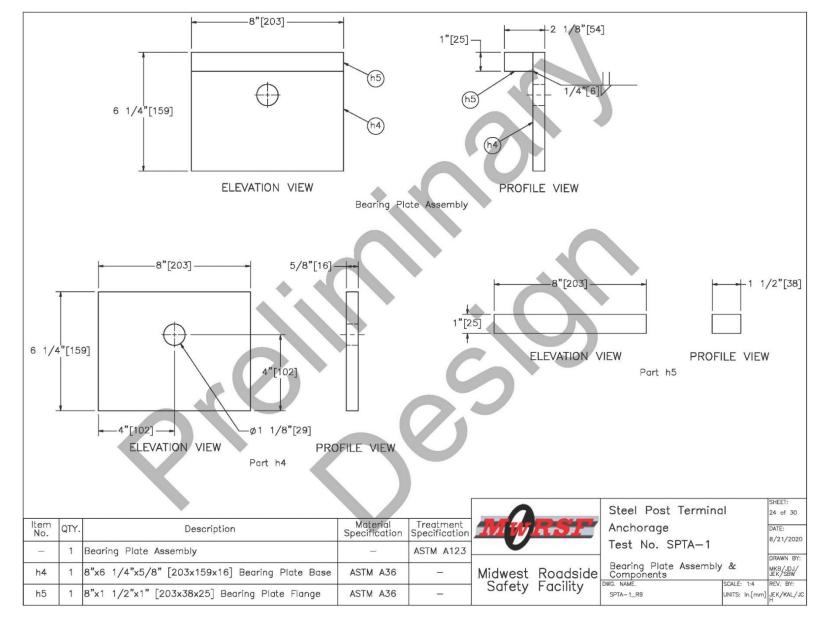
Bearing Plate Assembly and Components, Test No. SPTA-1
